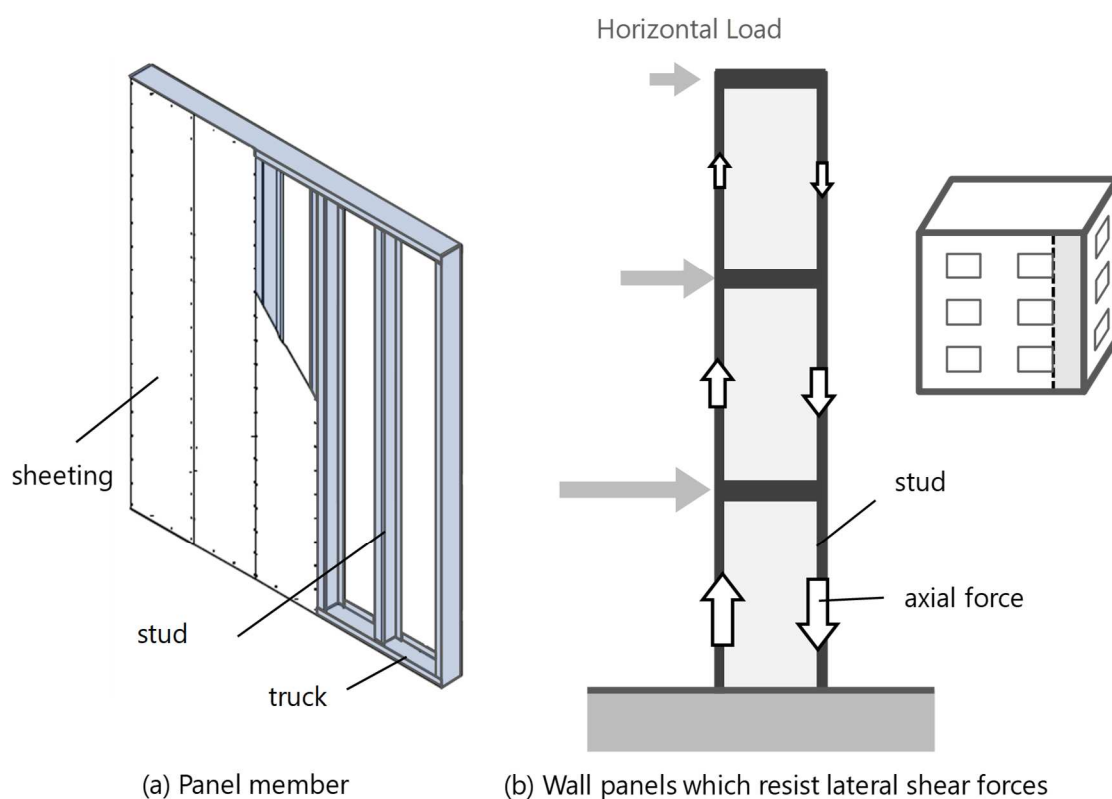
Structural requirements for the cold formed steel members framed inside the wall panel
